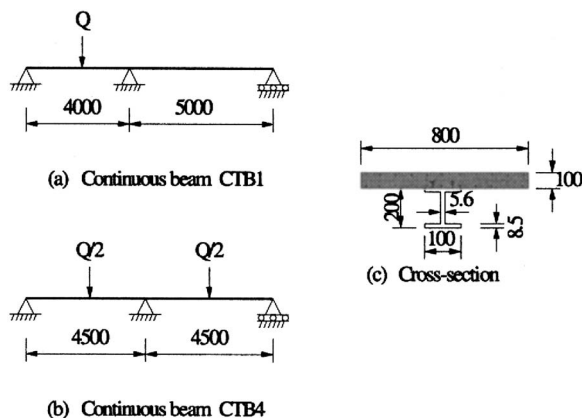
Continuous steel-concrete composite beams tested by Ansourian (1981)
